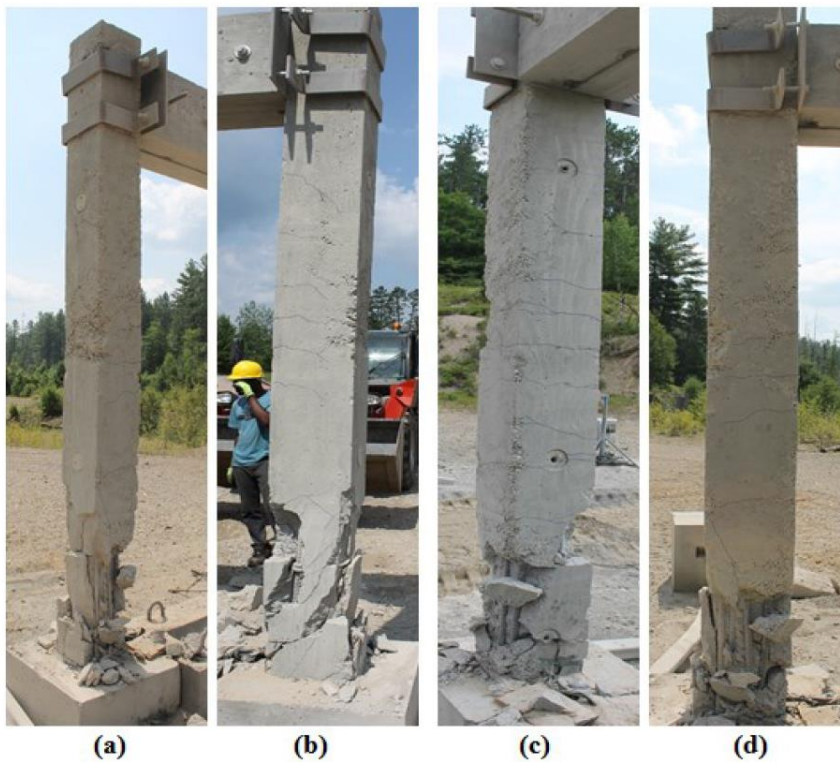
Farouk's Column (Conv20): (a) Front face, (b) Side face (right), (c) Back face and (d) Side face (left) [9]
